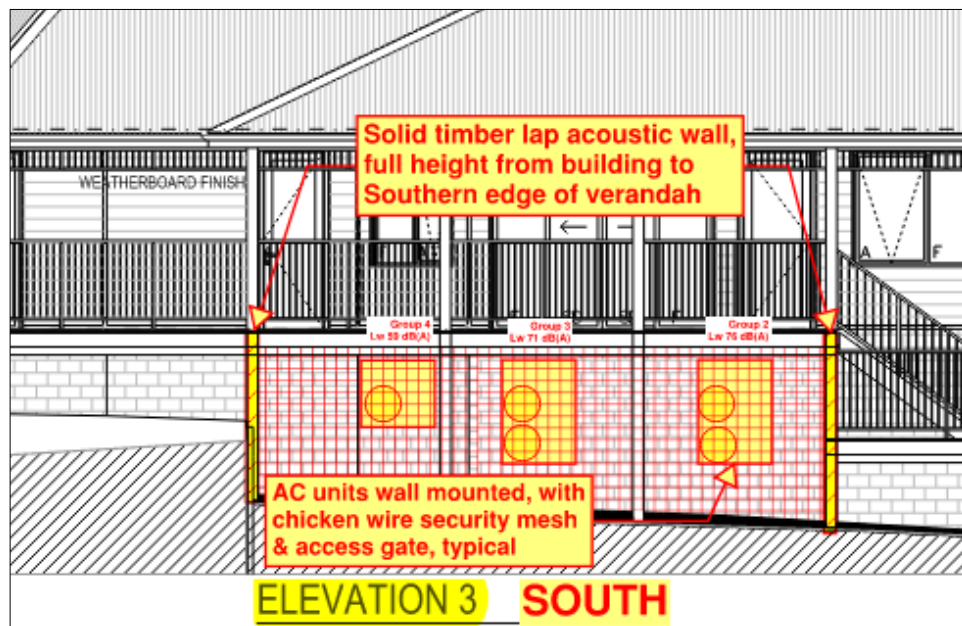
AIR CONDITIONING – GENERAL ARRANGEMENT SOUTH
